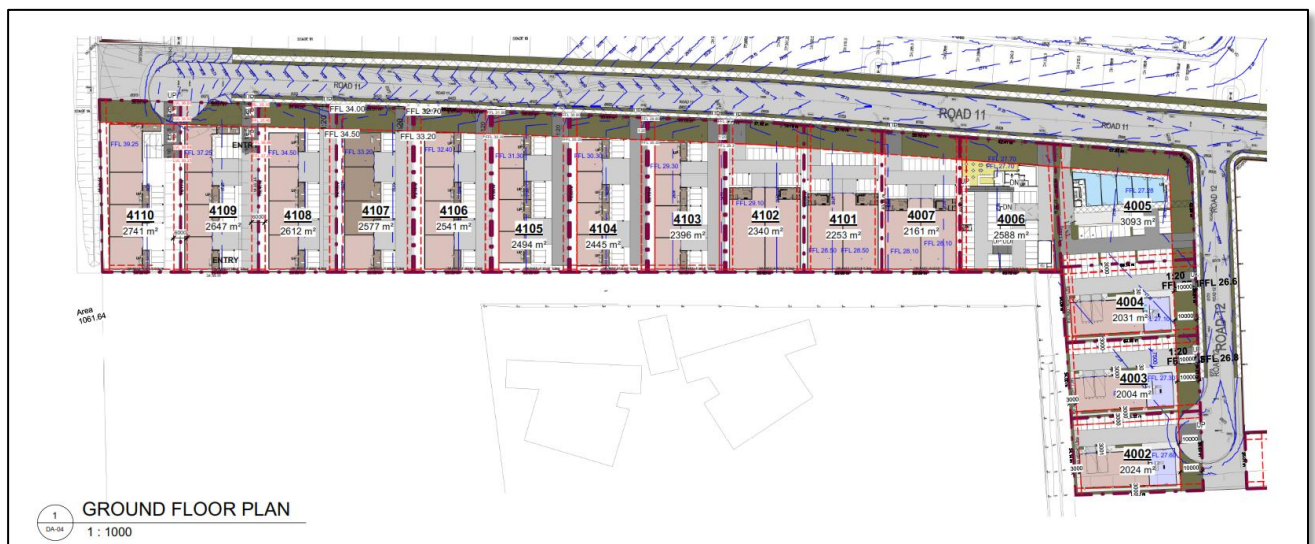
Proposed Ground Floor Layout Plan (Source: Extracted from Architectural Drawings)
